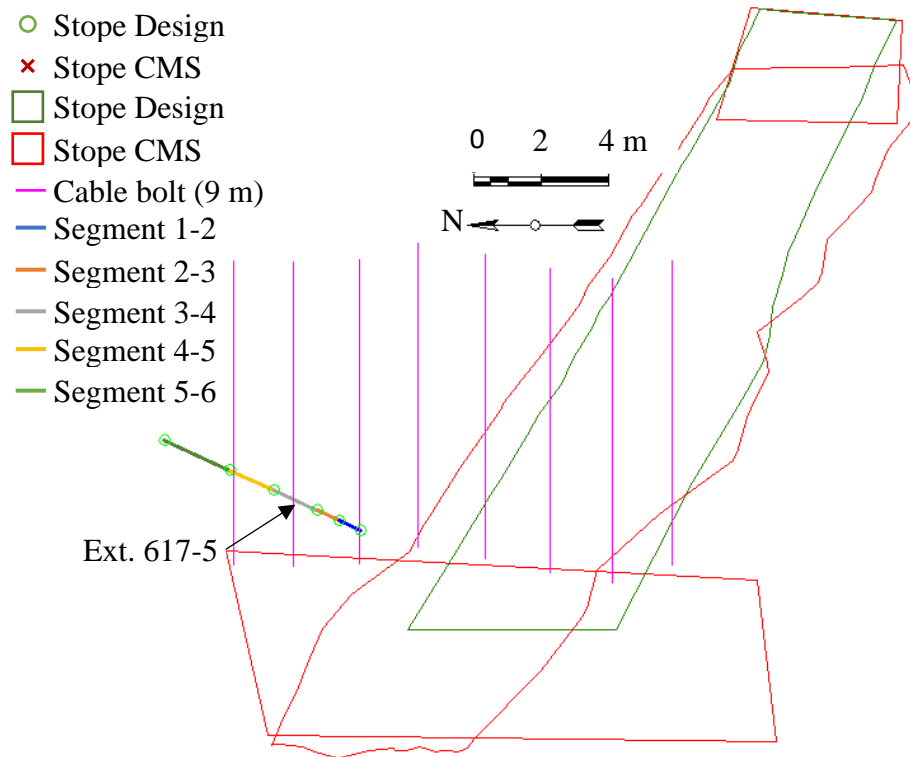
Cross section along XC-5 of the Santoy 30-31L longhole stope looking east and showing the stope design outline, extensometer locations, ground support, surveys, and CMS.
